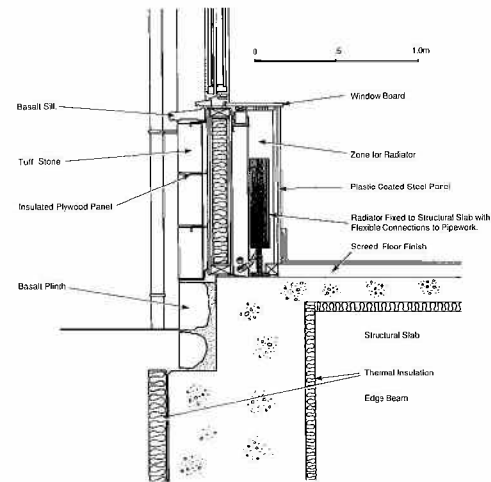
Section through perimeter heating showing insulation and connections to structural slab
